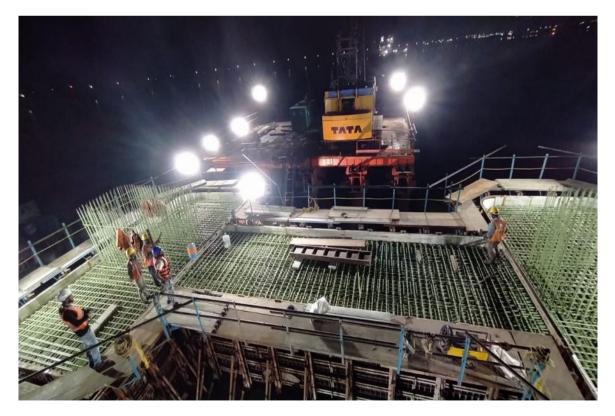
MP 93 Pile Cap Pre-pour Inspection- Marine Area
